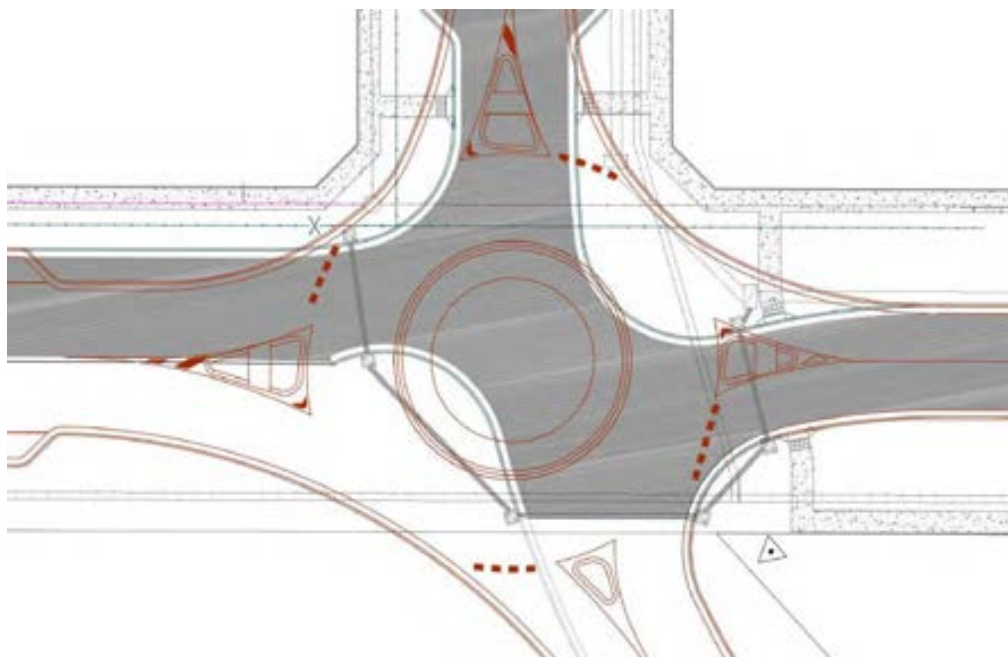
initial functional layout plan for DI_RD_31d/Settlers Drive intersection.
